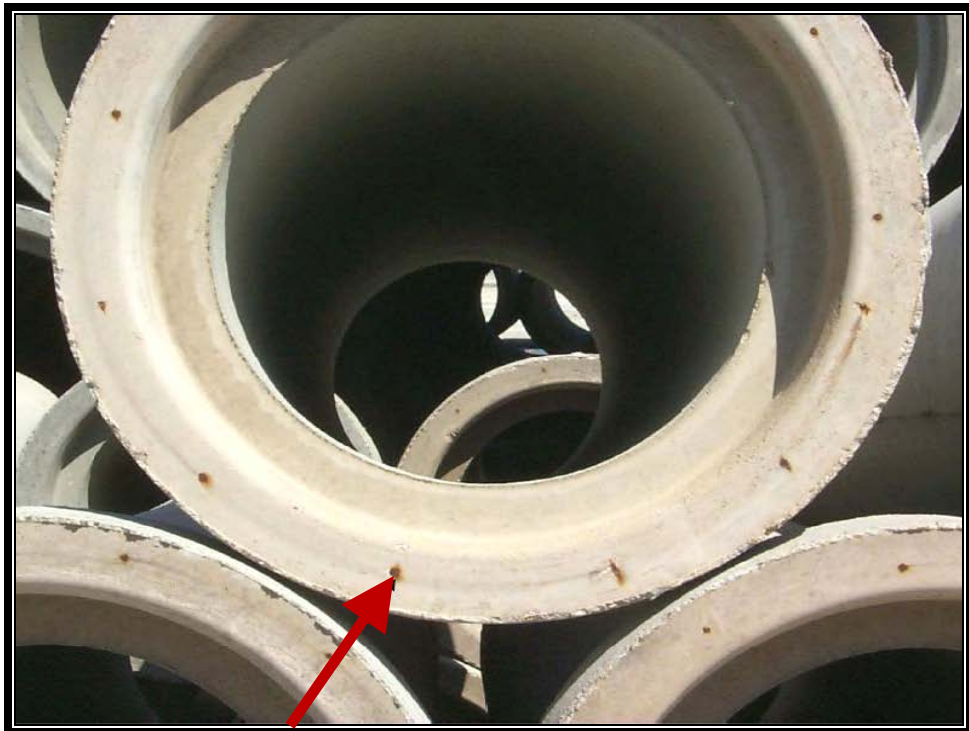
Exposed Longitudinal Reinforcement – Acceptable
